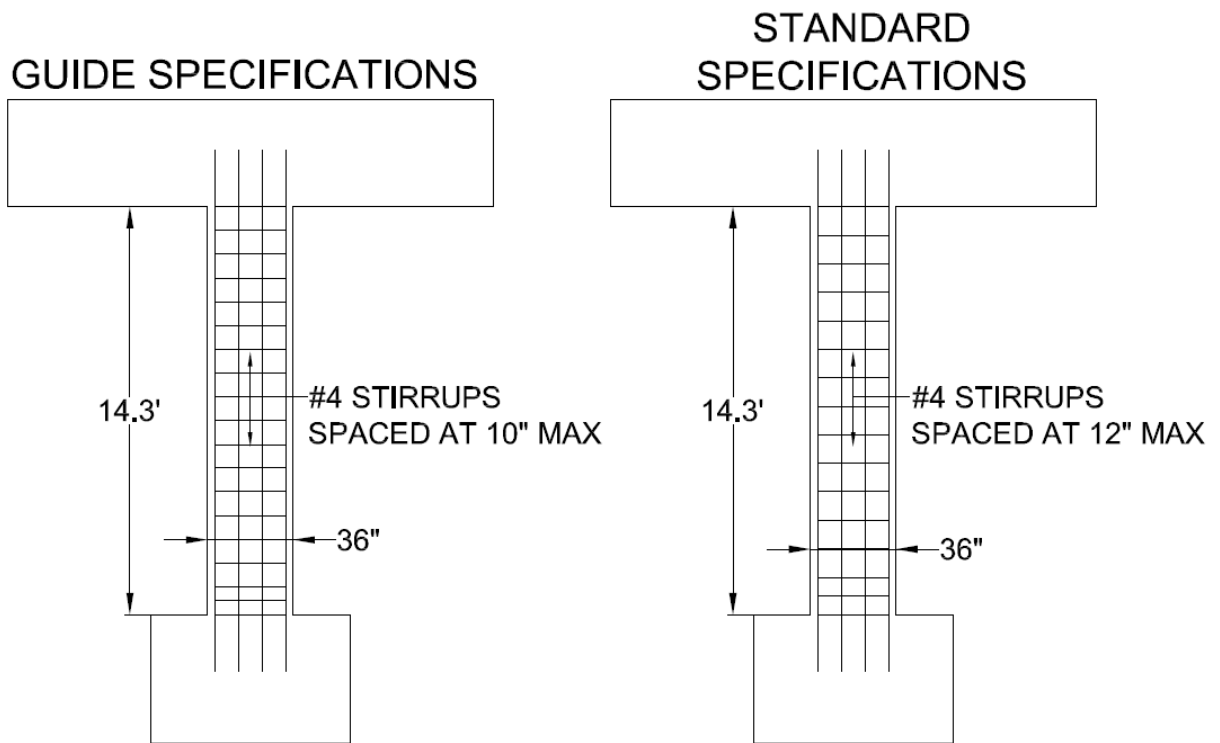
Stave Creek Bridge Bent 3 Final Design Details (SDC A1)
